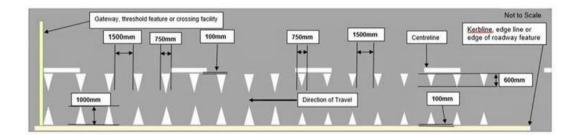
Layout of Shark's Teeth to be used at Makahu School
